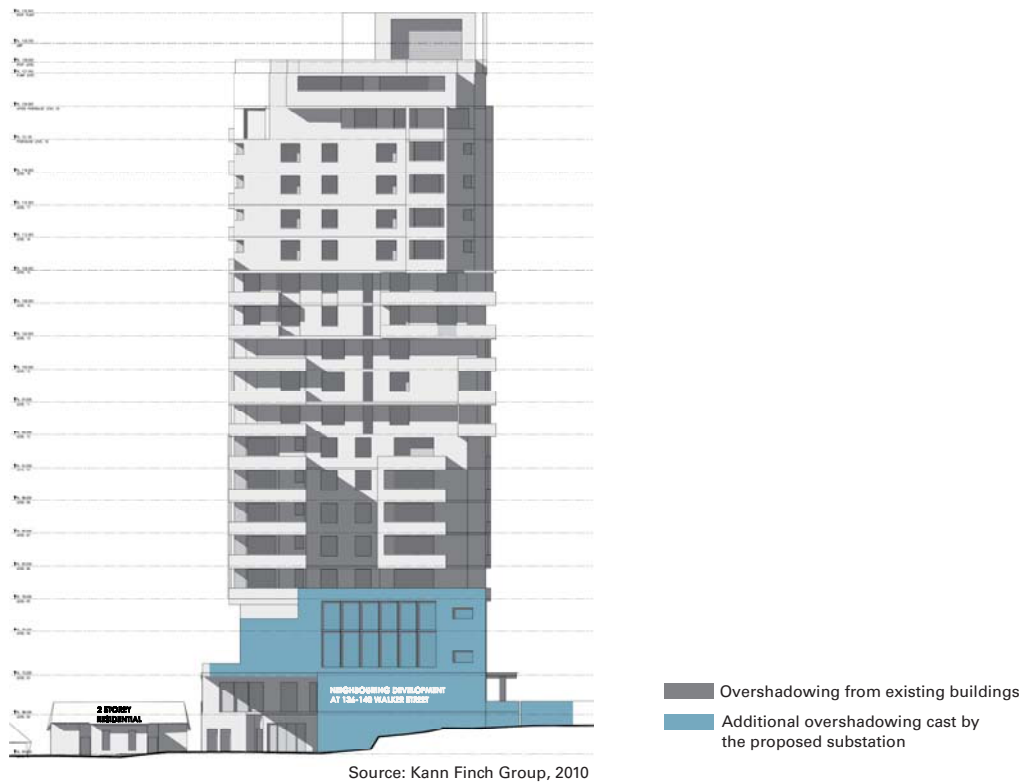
Additional Shadows Cast by Proposed Substation (June 21 12h00) - Western Elevation
